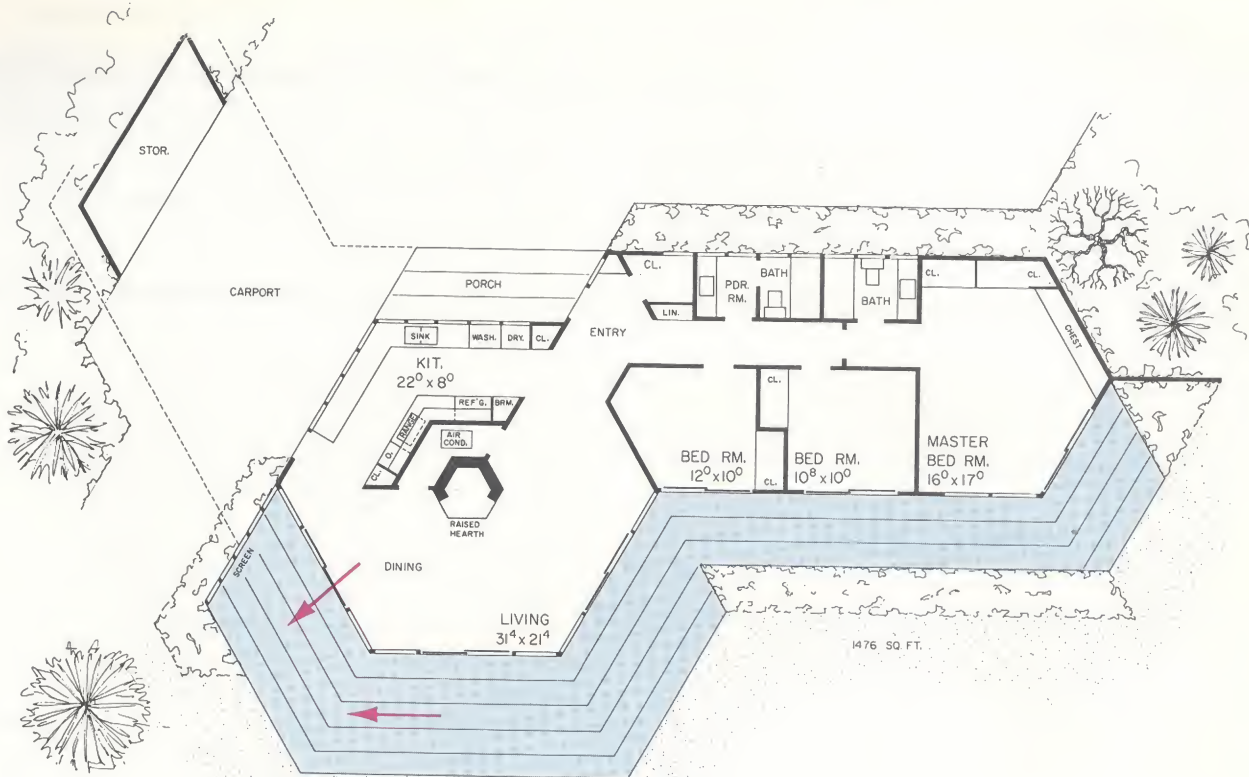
Location of a dining porch. (*Home Planners, Inc.*)
